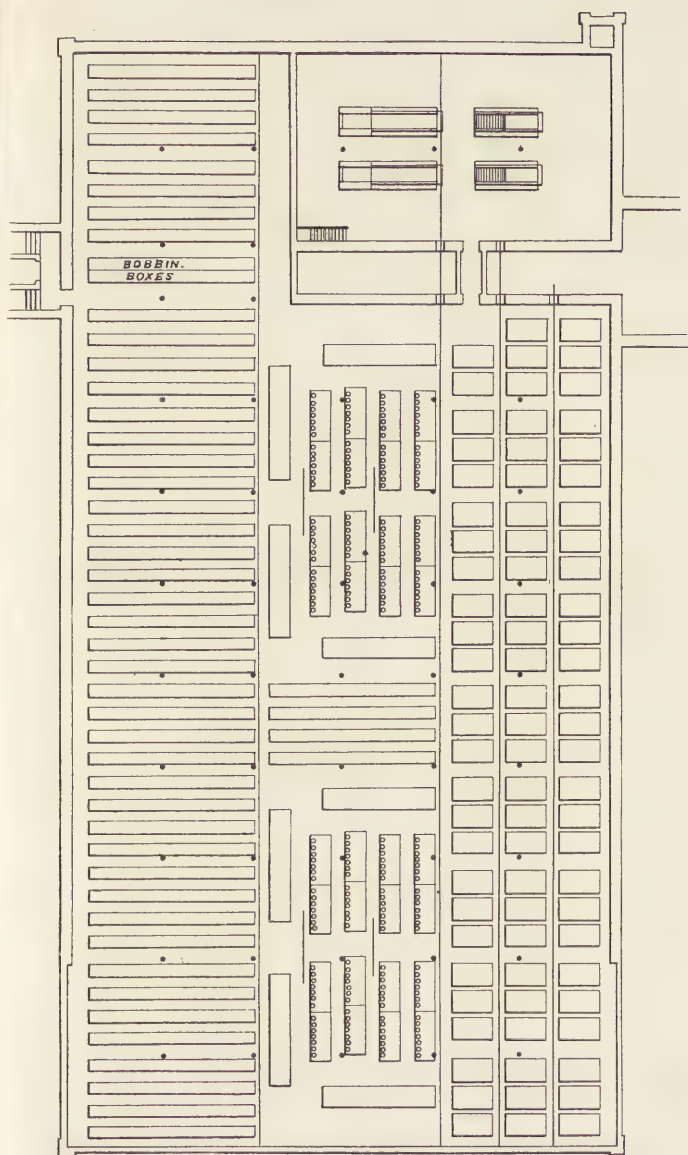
PLAN OF EGYPTIAN COTTON MILL. (Ground floor.)
